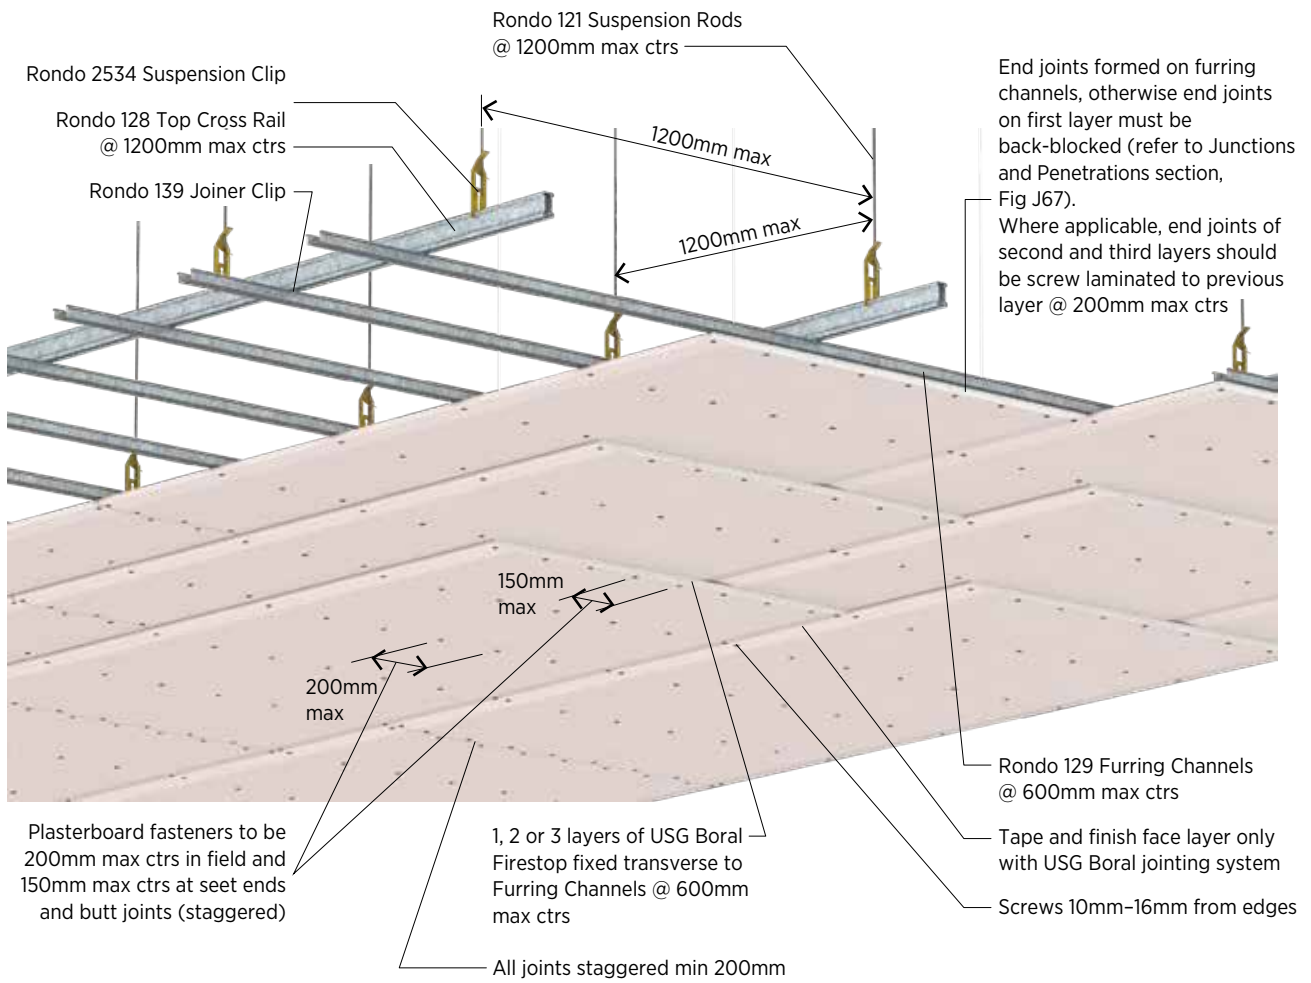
Fire Rated Ceiling – Screw Fixing Layout
